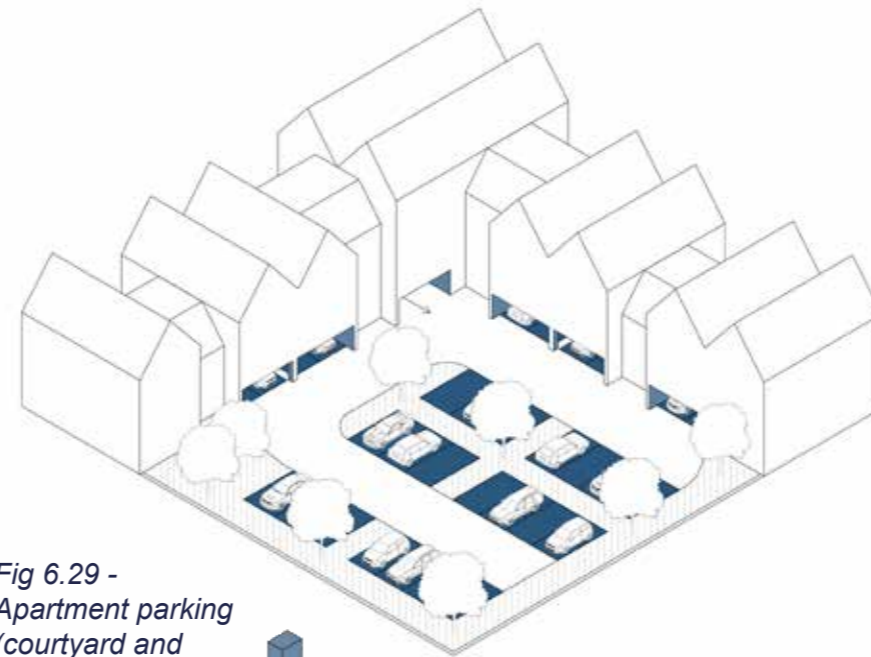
Apartment parking (courtyard and undercroft parking)
